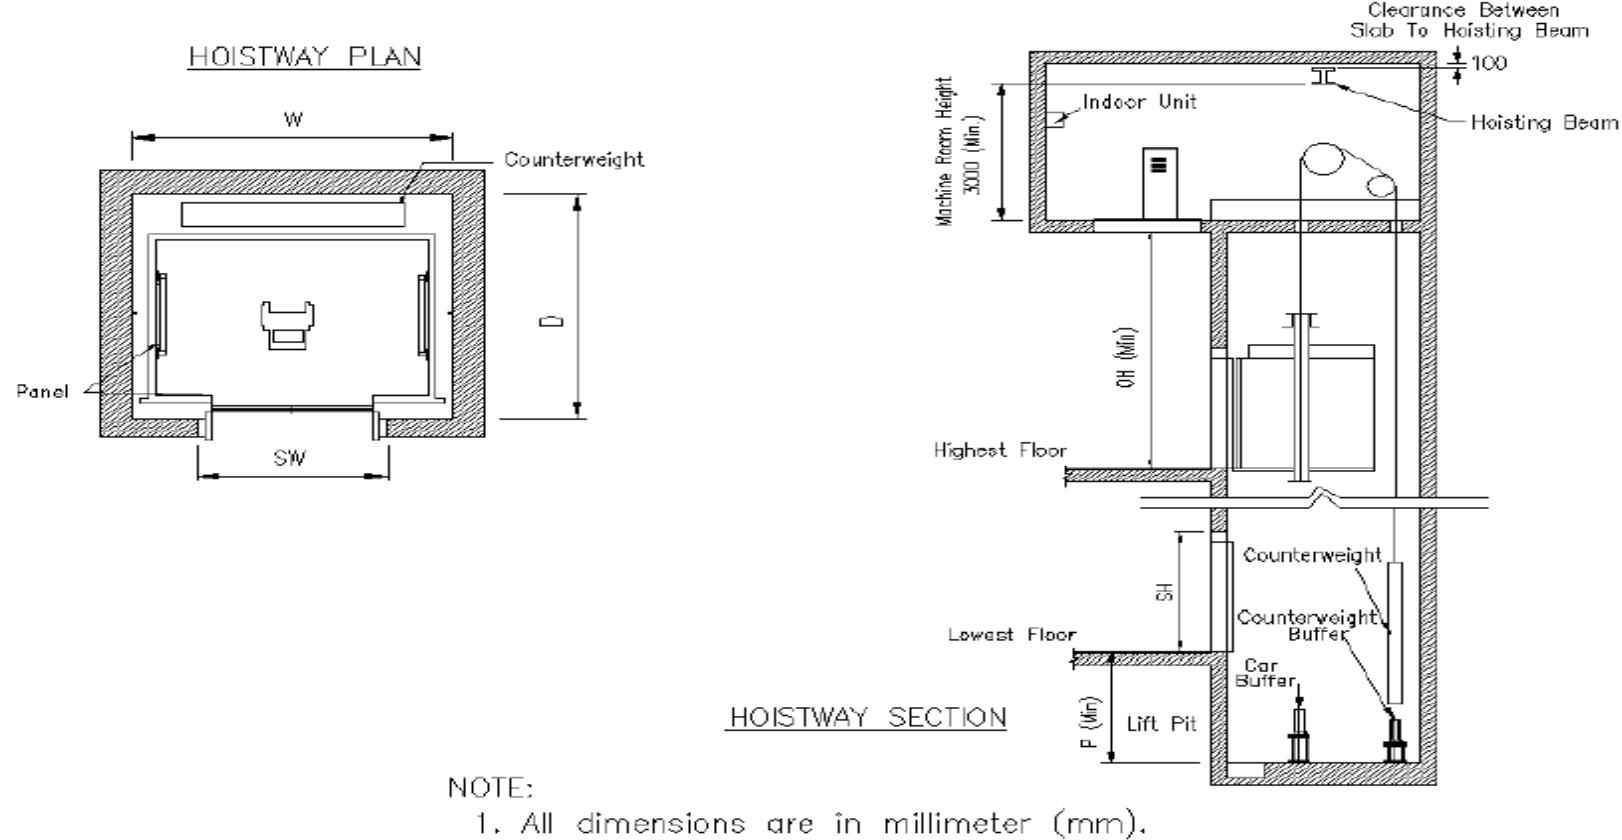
General Plant Room Layout and Dimensions For Hospital and Stretcher Lift
